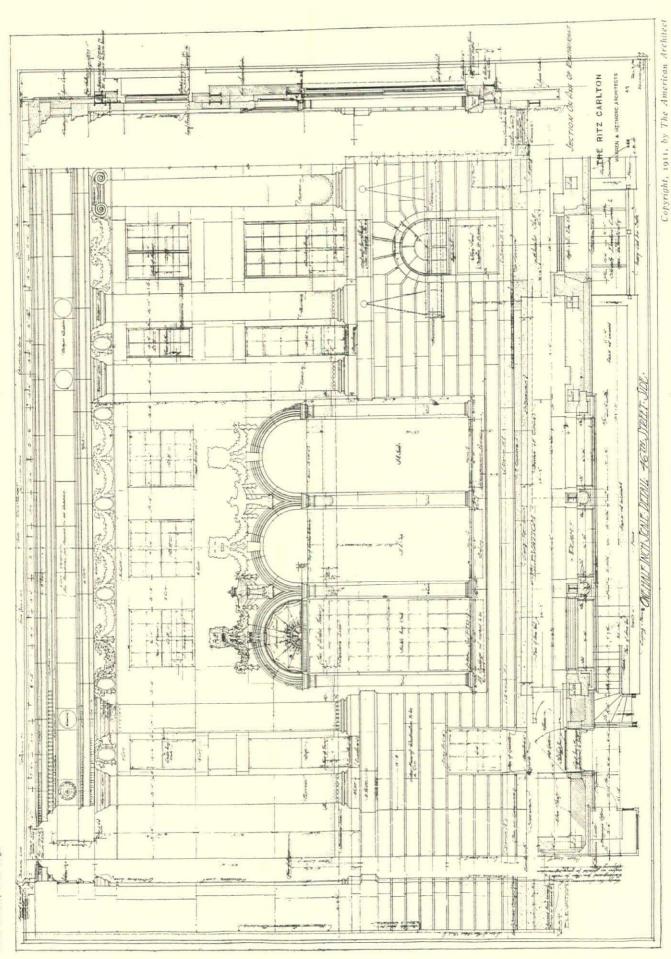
DETAIL OF LOWER PART OF BUILDING ON MADISON AVENUE
